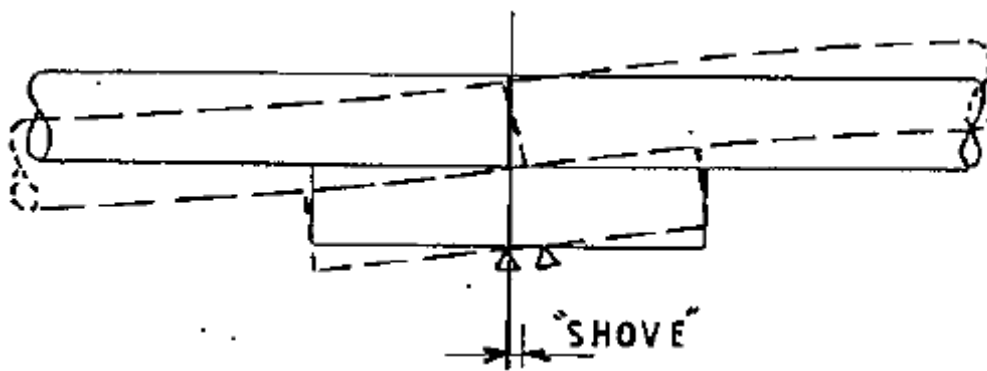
Longitudinal Forces on Piers due to Effects of Corbel Rocking (from Yttrup, Law & Audova)
